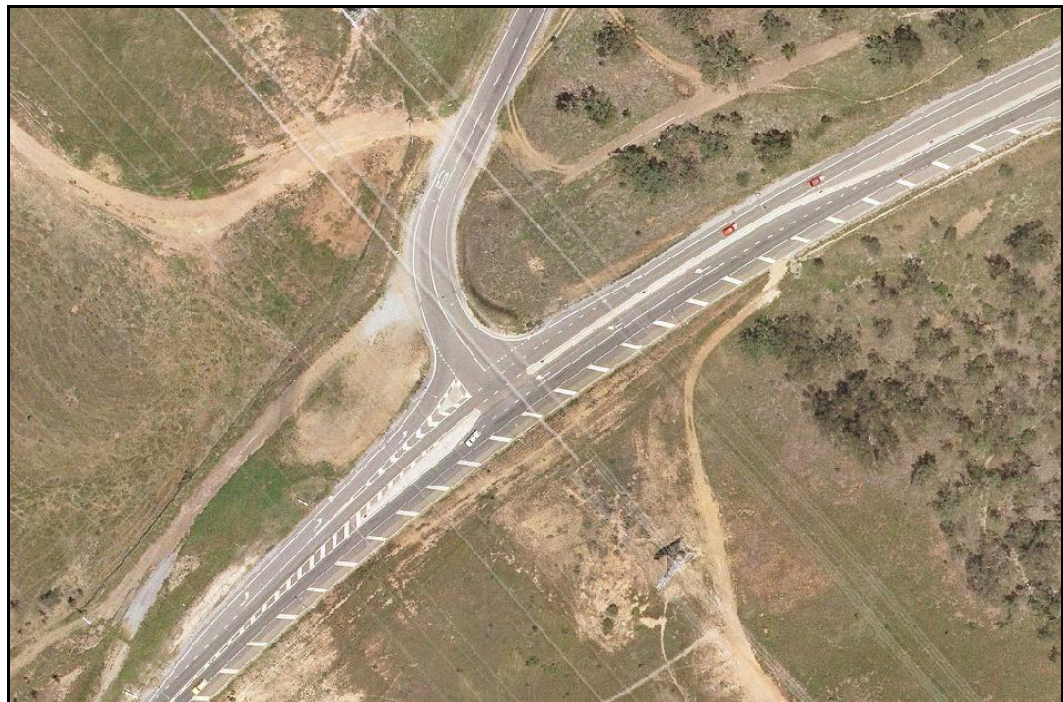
Dawson Highway/Don Young Drive – Existing Layout
